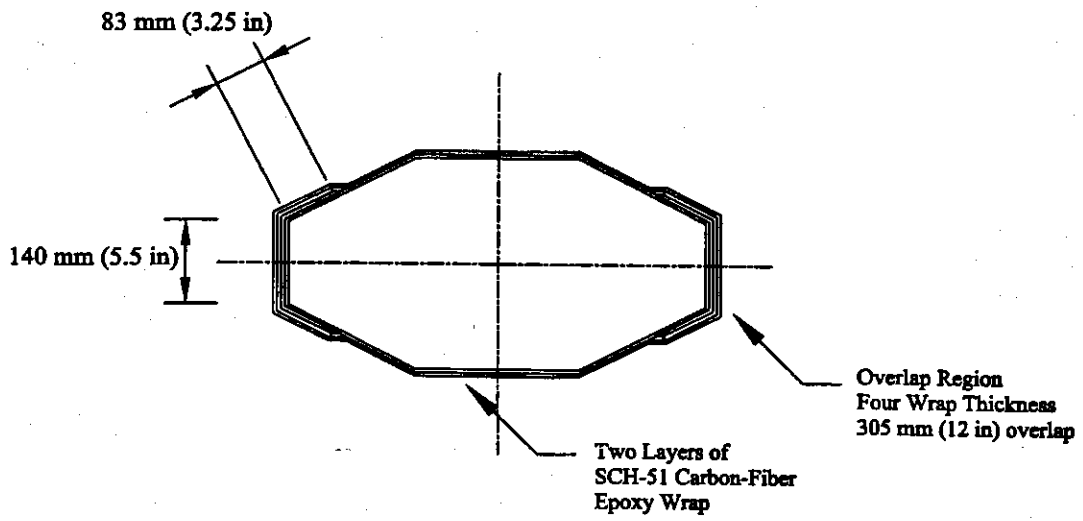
9 Typical FRC Jacketed Test Specimen Cross-Section
